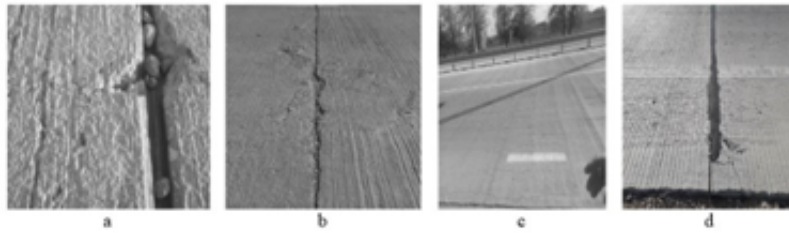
Pavement defects* a) Defective joint seals; b) Shallow joint spalls; c) Longitudinal cracks; d) Fracture of the covering edges [11].
